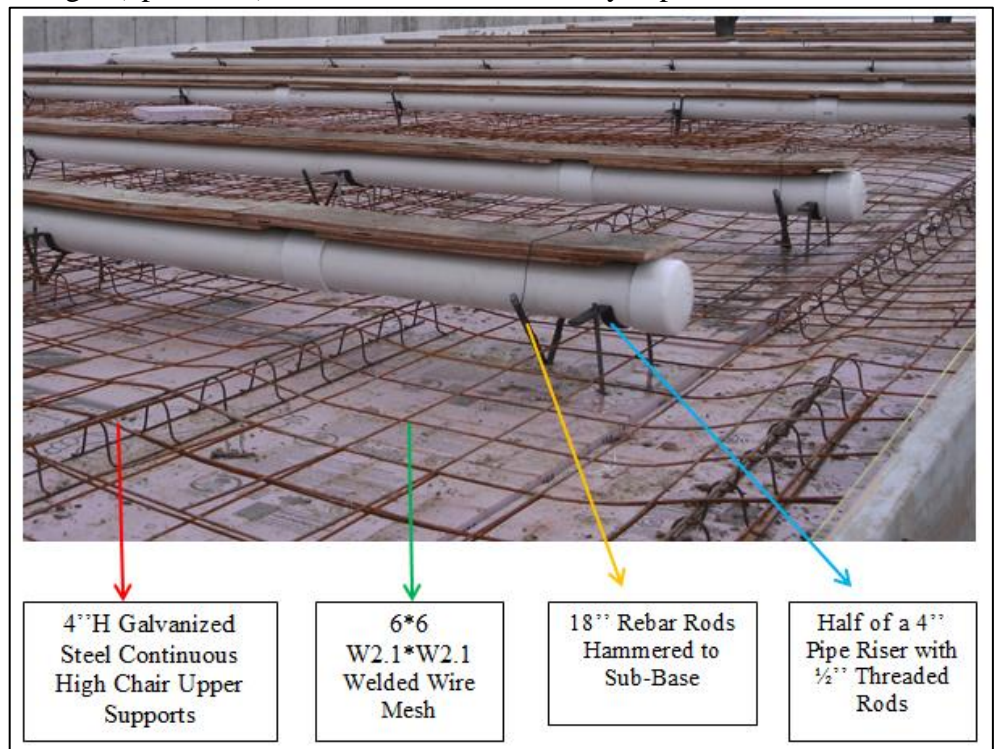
Aeration Line Form Setup Prior to Concrete Pour
